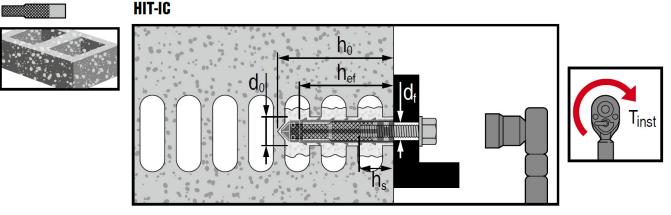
HIT-IC Installation in Ungrouted CMU
